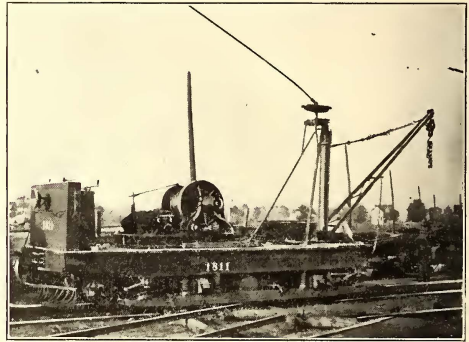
DERRICK CAR USED ABOUT THE YARD AND IN TRACK CONSTRUCTION
